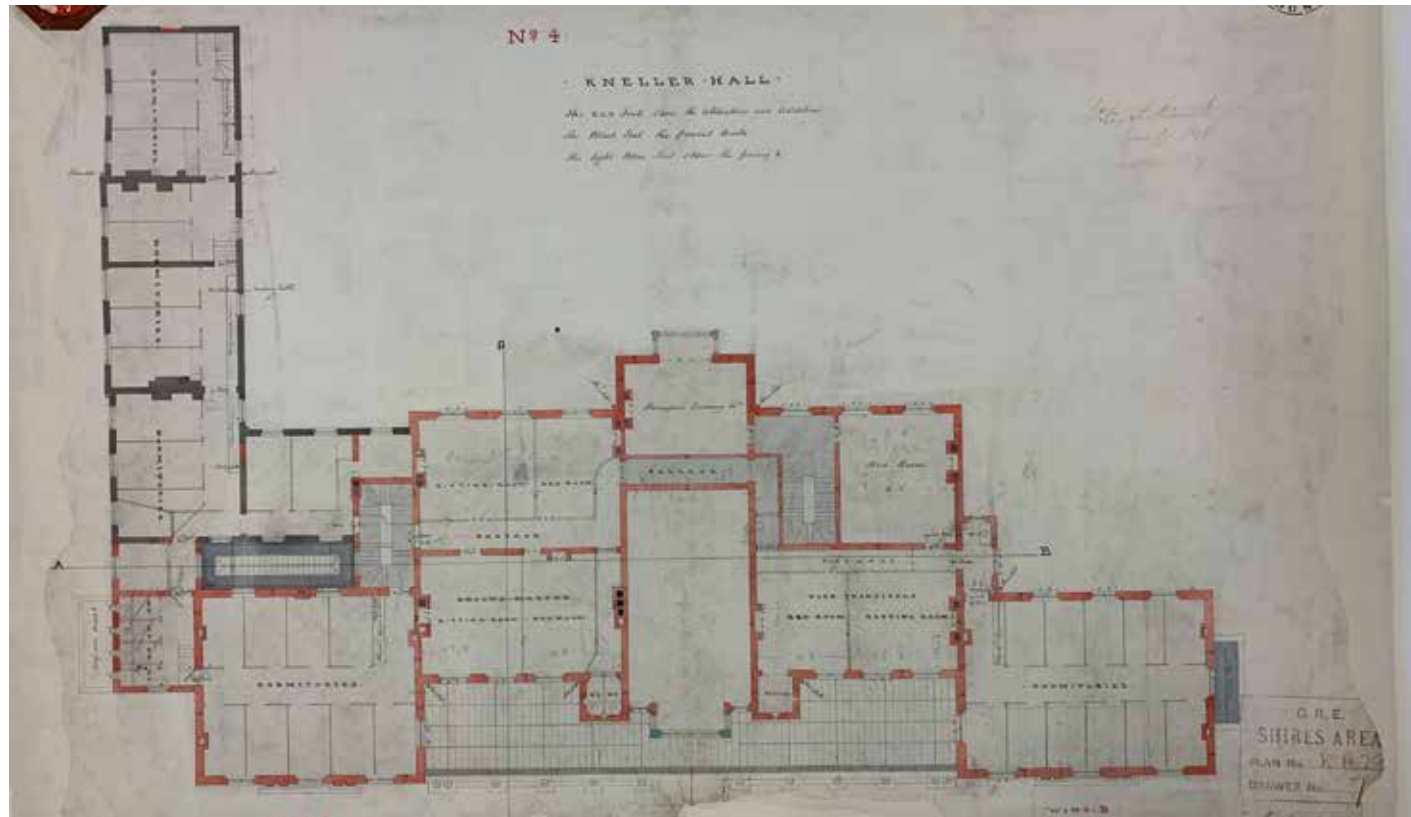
1844 proposed first floor plan of Kneller Hall, partially realised (black showing the existing building and red showing the proposal). By George Mair.
